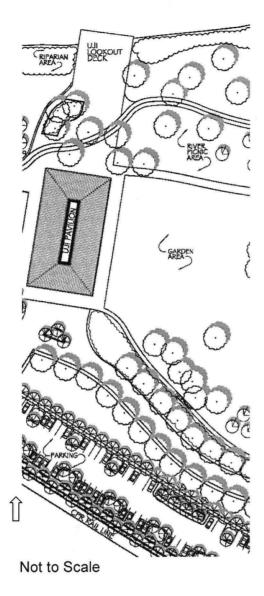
Plan view of Uji Cultural Pavilion next to garden area and parking
